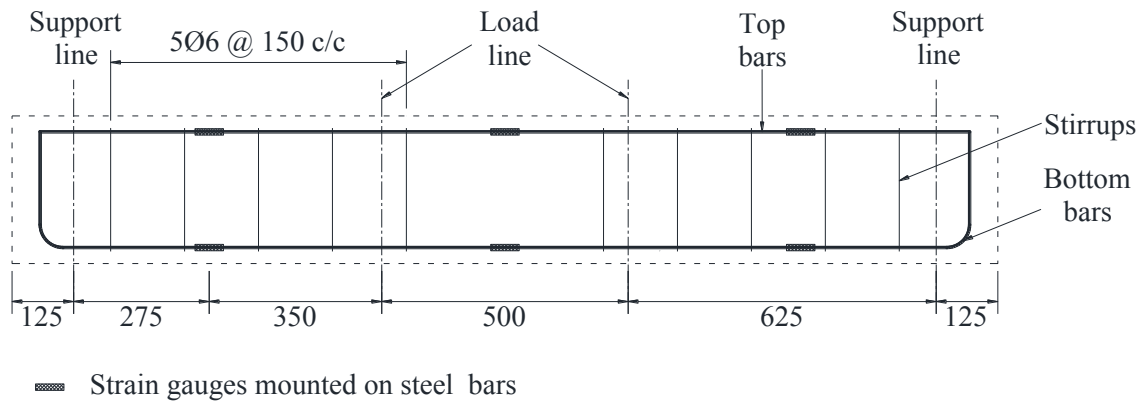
Instrumentation scheme for the reinforcement bars embedded in UHPC beams.
